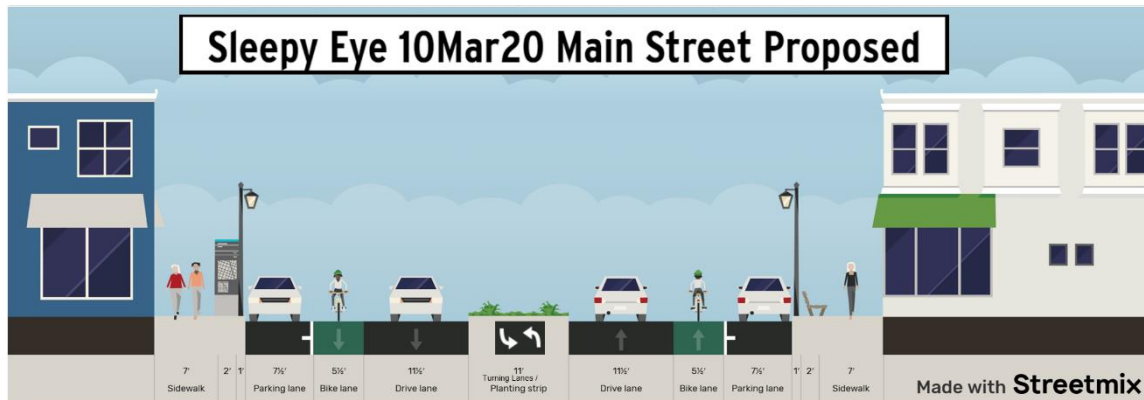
Sleepy Eye Site: Proposed Dimension Usage - Roadway, Sidewalk
